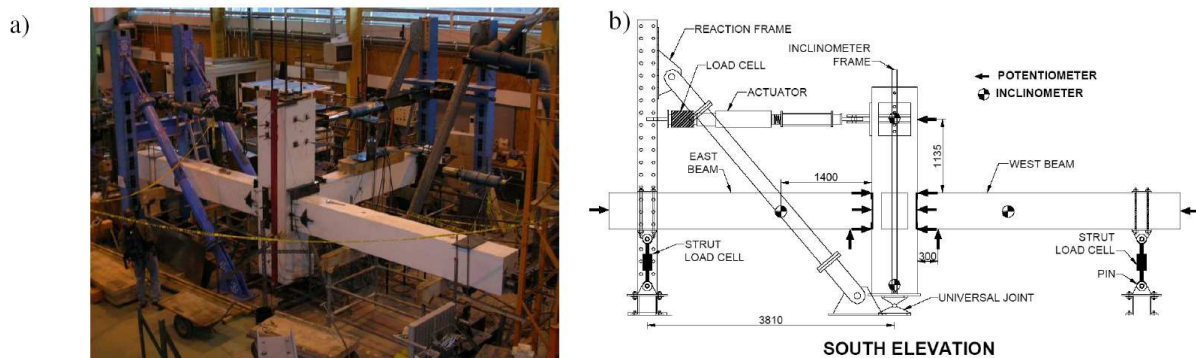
a) Photograph of test specimen, and b) Schematic south elevation of test setup
